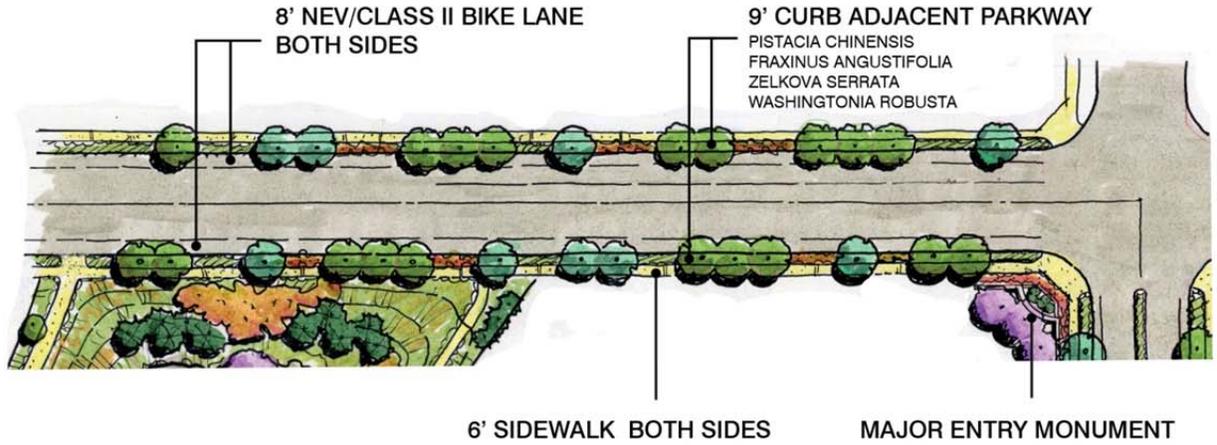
B. Street Sections: Myers Street South of Devonshire
